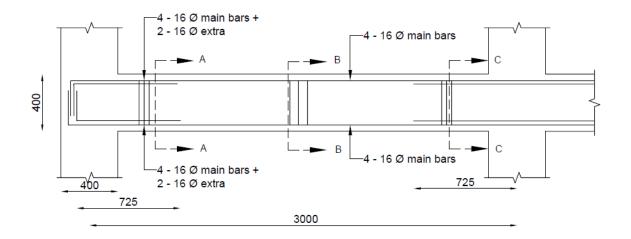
Detailing for beams from 3rd floor to 5th floor
